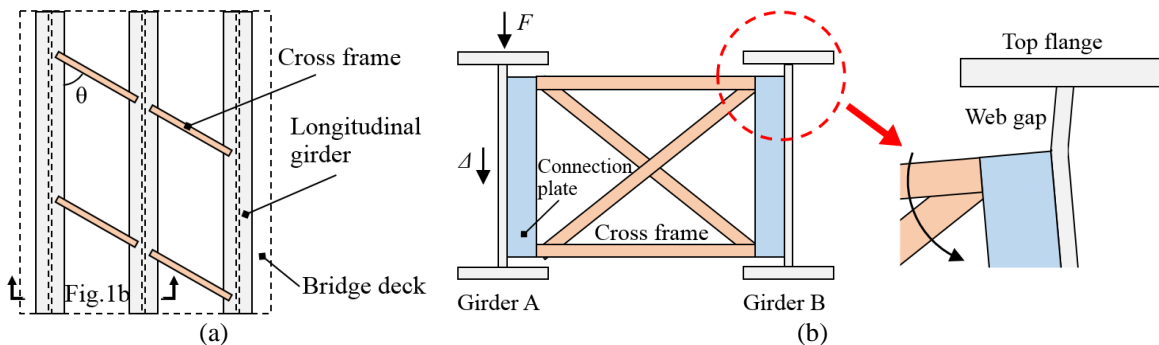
Schematic of a girder bridge under traffic load: (a) plan view; and (b) elevation view and detail of the web-gap region.
